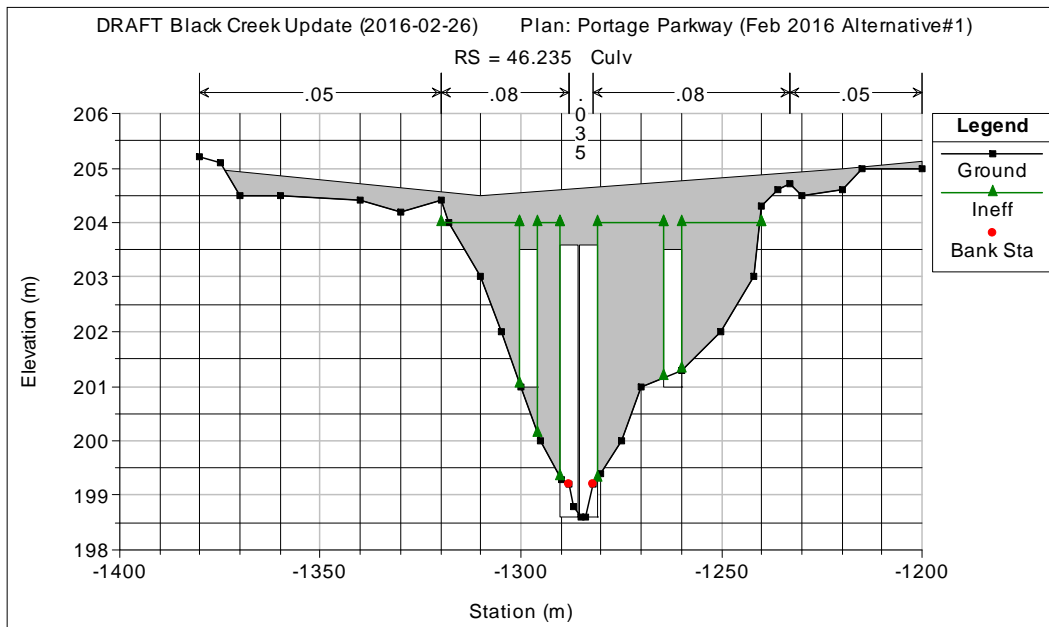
Option 1: Twin 4.5 m Concrete Box Culverts
